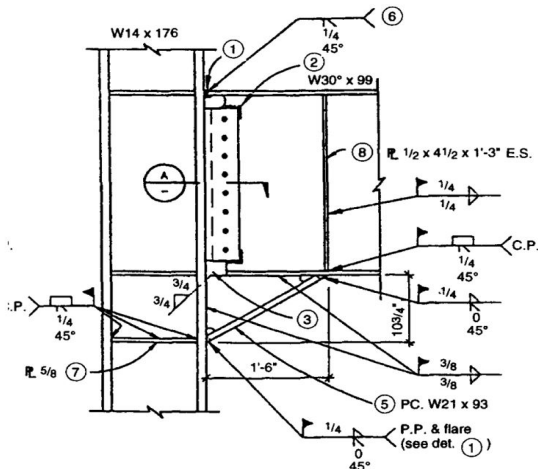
A welded bottom haunch retrofit (Uang et al. 1998)
